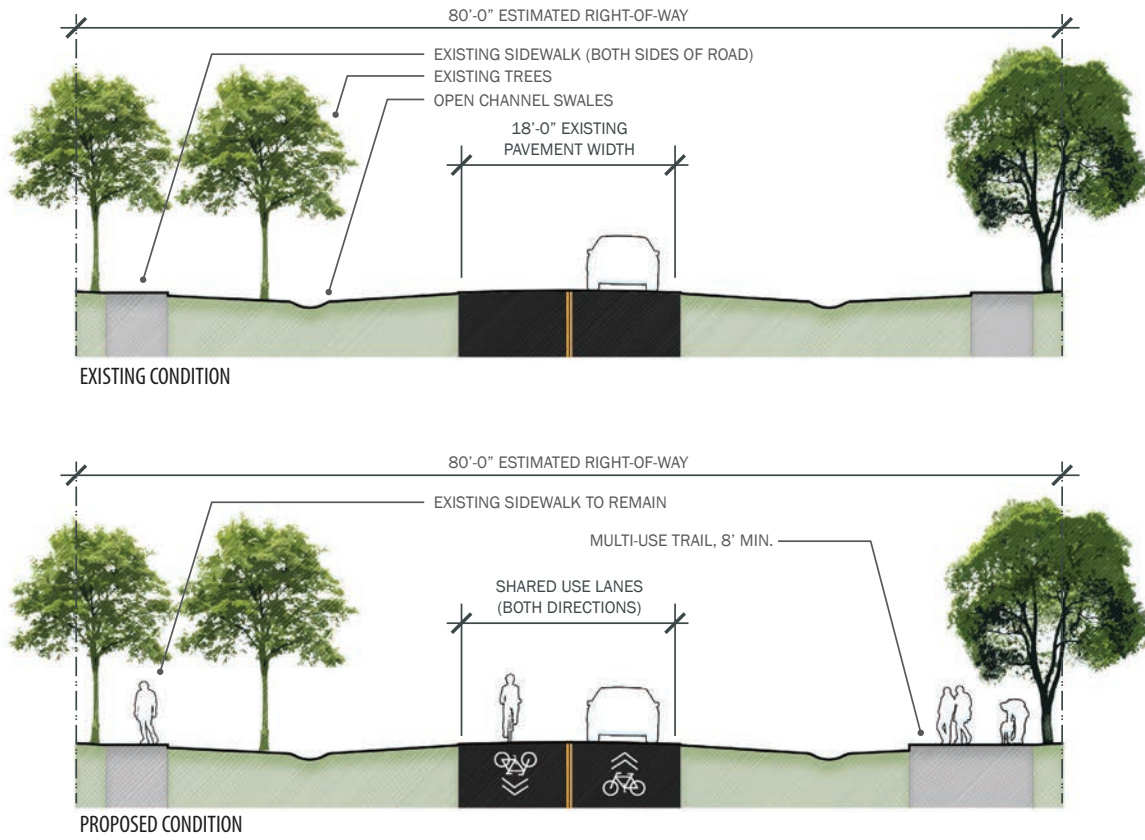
Cross-section study of existing and proposed conditions of typical corridor with 80' right-of-way
